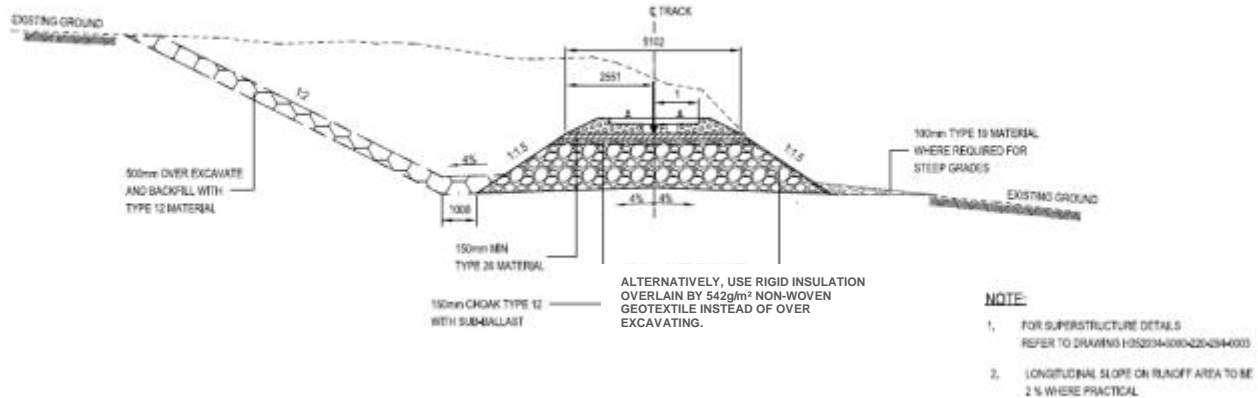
Typical Cross Section Railway Embankment in Soil Cut – Section IV
